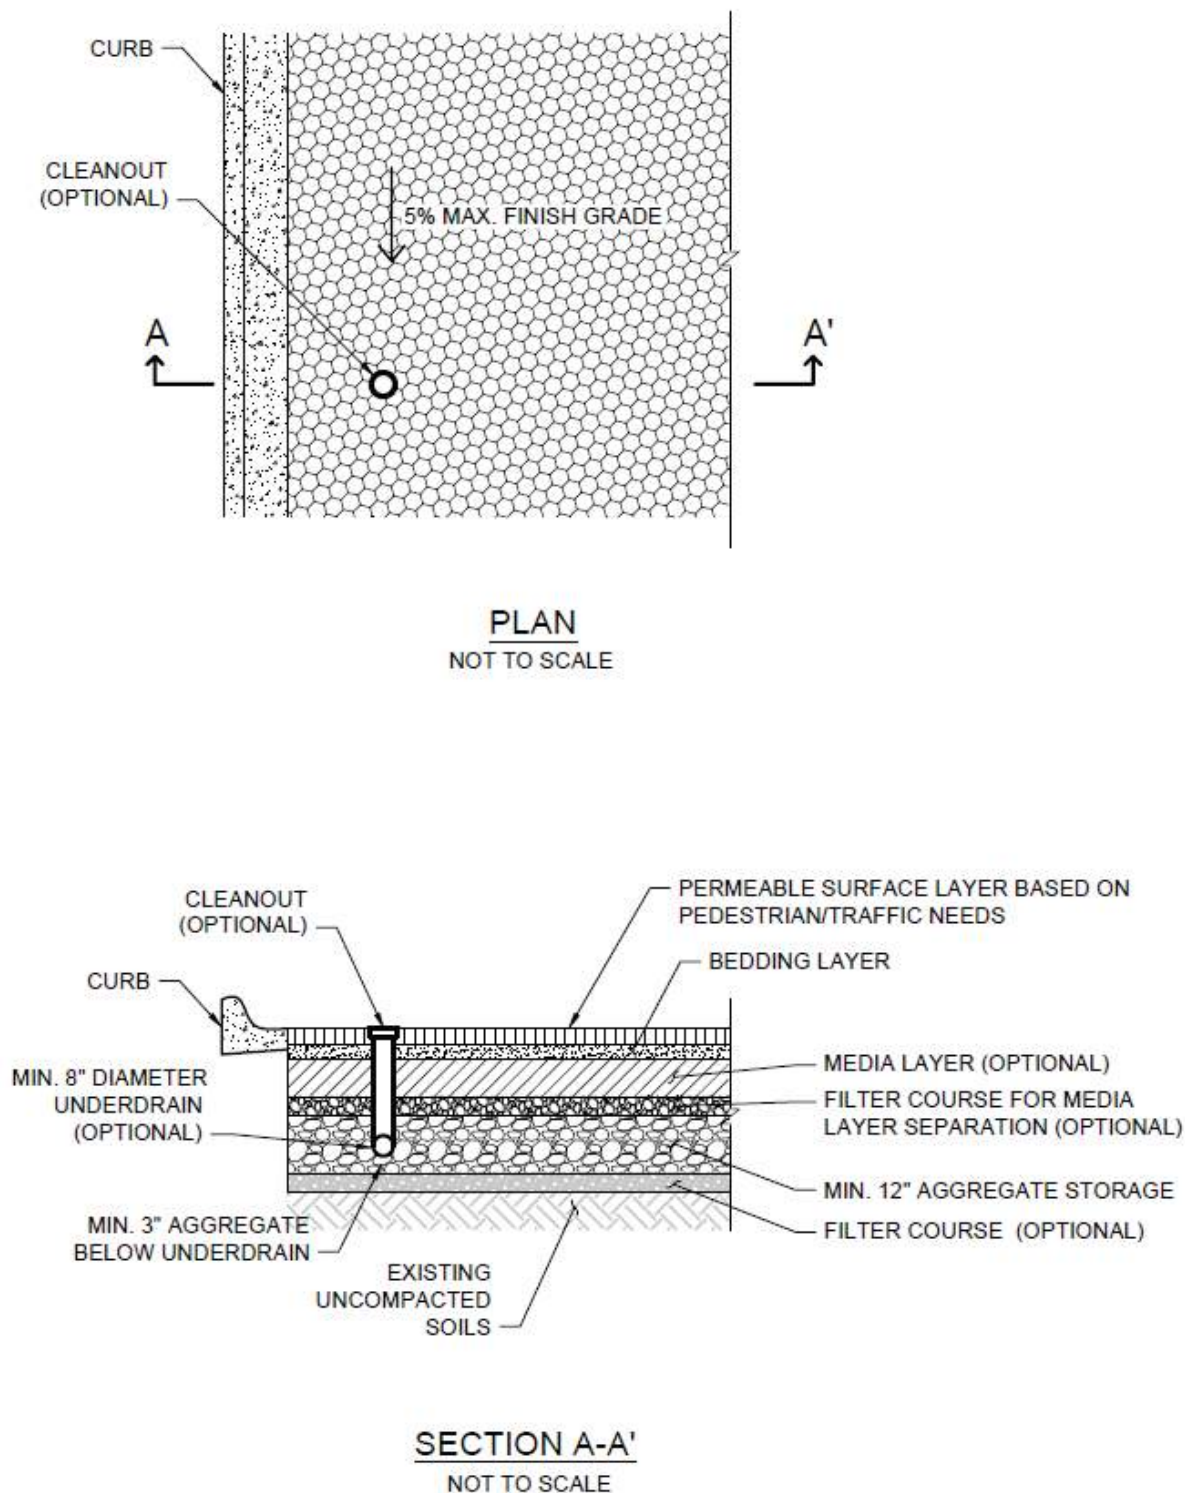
E.11-1: Typical plan and Section view of a Permeable Pavement BMP
